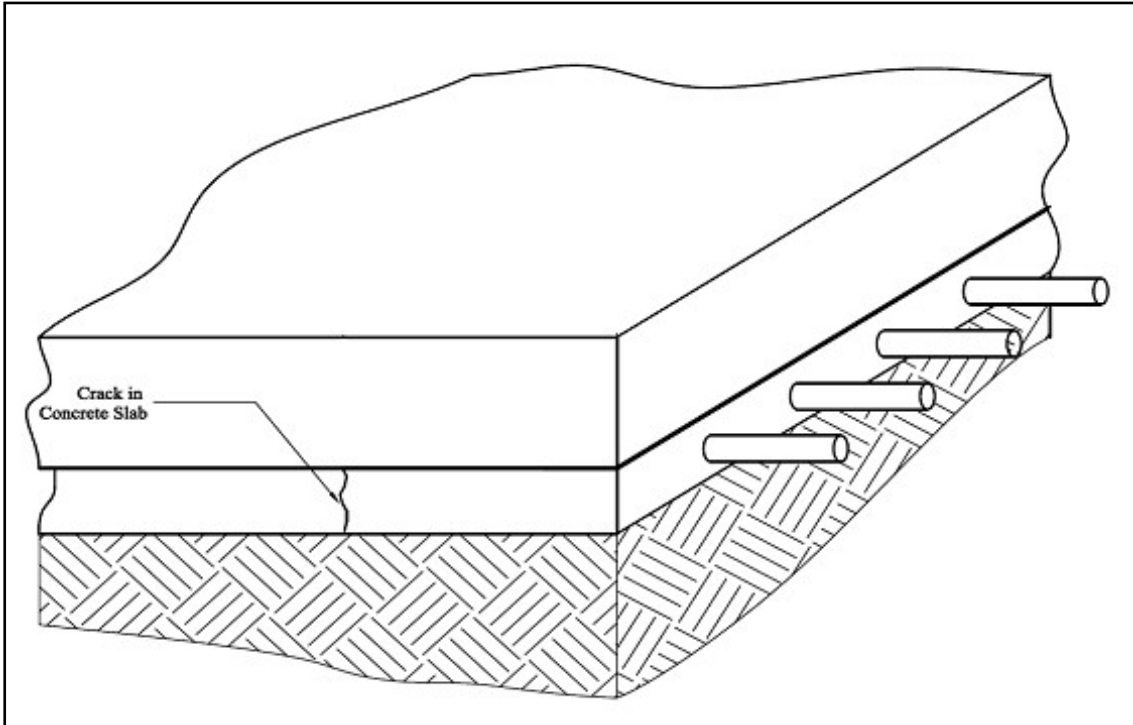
Transverse Crack in the Concrete Slab Underneath the 4-inch TCO Pavement
